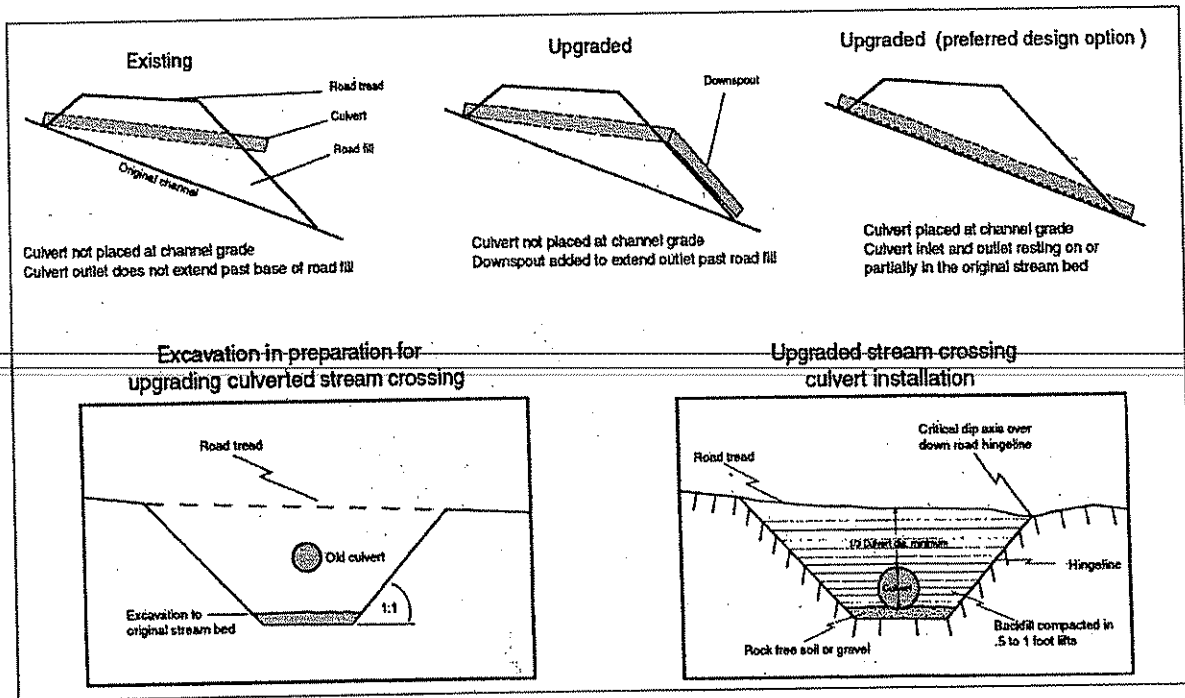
Typical culvert installation on non fish-bearing streams.
